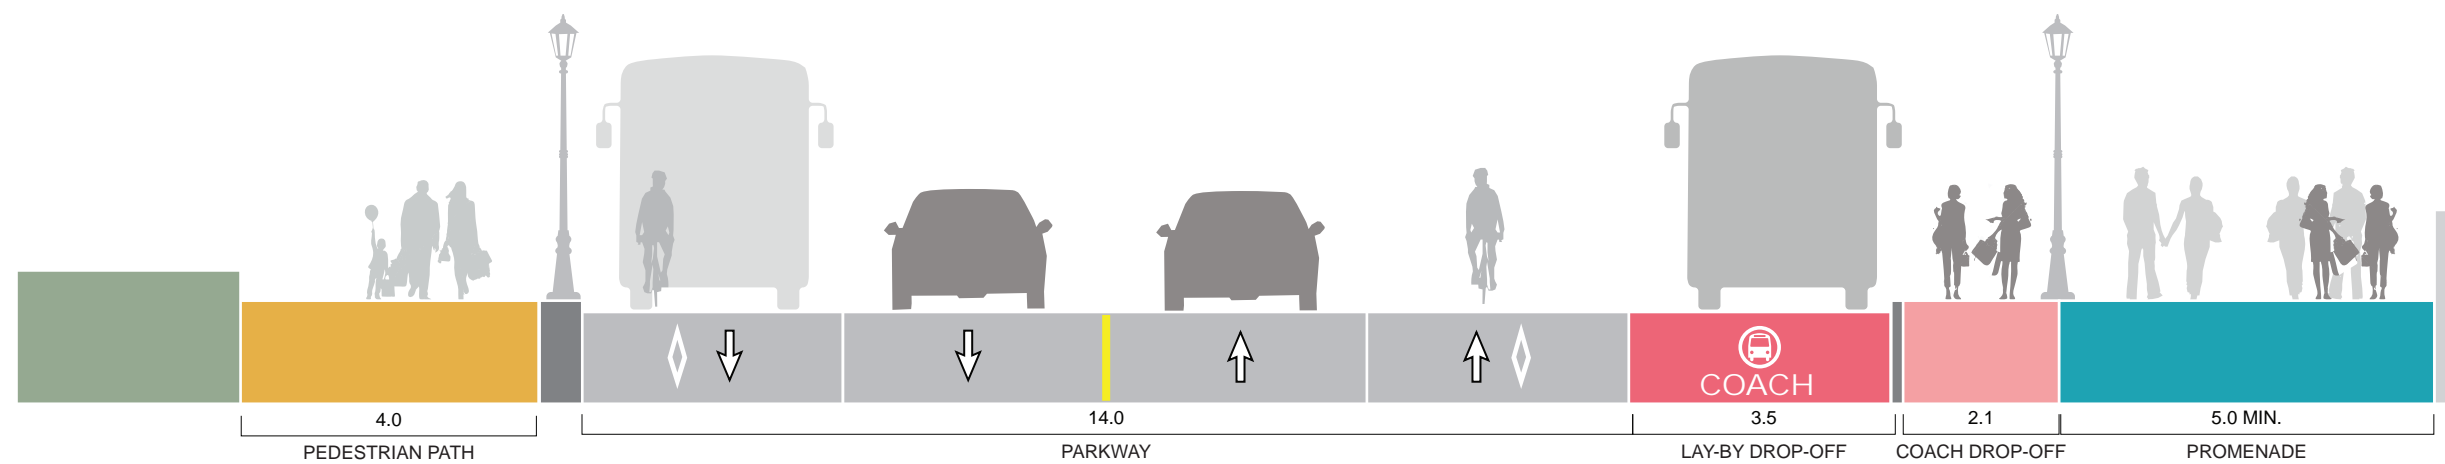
Parkway Section F: Clifton Hill to Rainbow Bridge - looking northward
